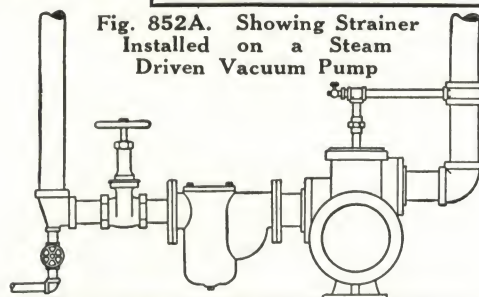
A. Showing Strainer Installed on a Steam Driven Vacuum Pump
